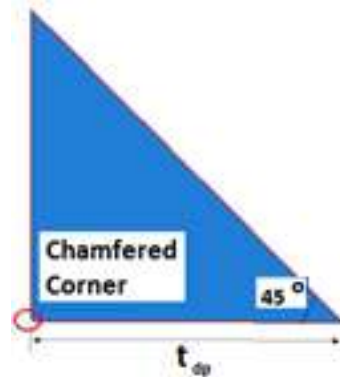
Horizontal fillet welds between the DP and the column web
